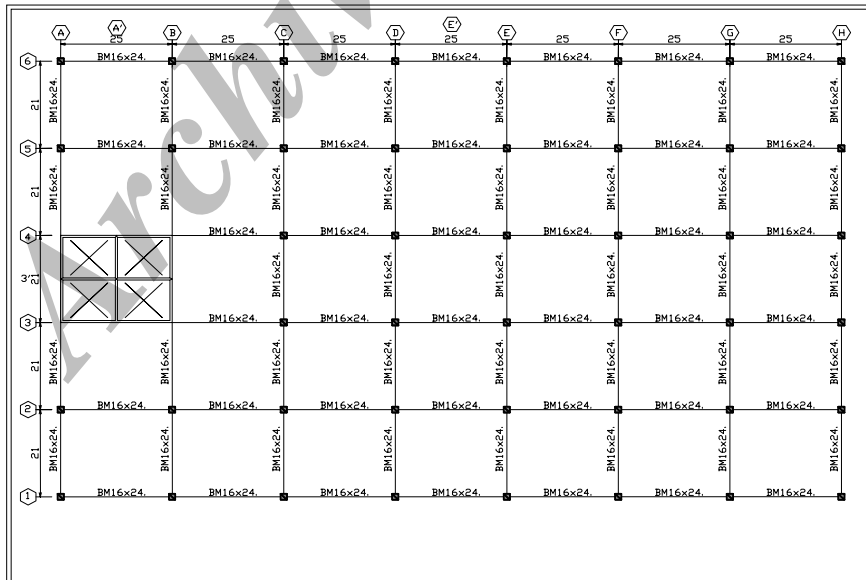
Plan of building (shear wall displaced 75 ft (22.8 m) IN X-DI rection)
